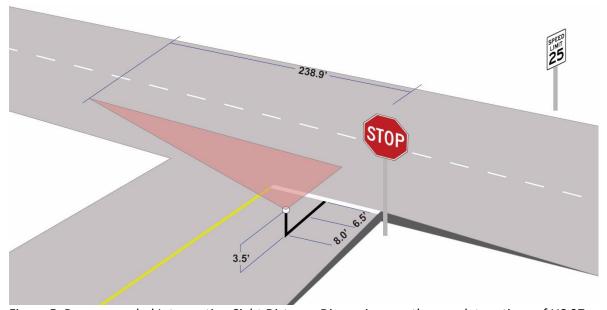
Recommended Intersection Sight Distance Dimensions on the couplet sections of US 97.
